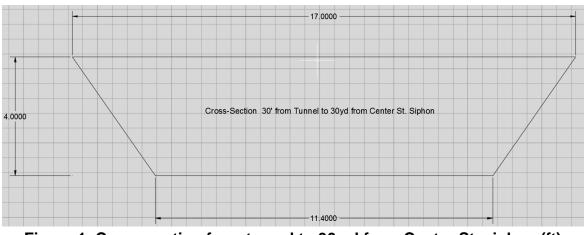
Cross-section from tunnel to 30 yd from Center St. siphon (ft)
